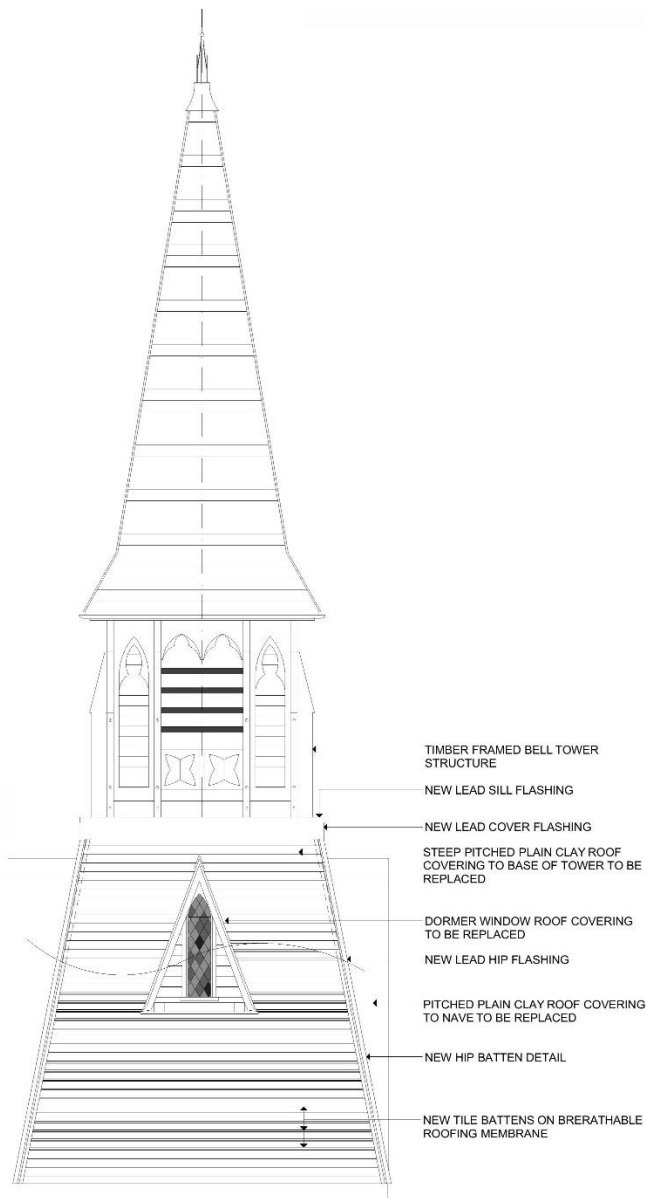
Extract from application drawing showing the proposed Bell Tower (NTS).
